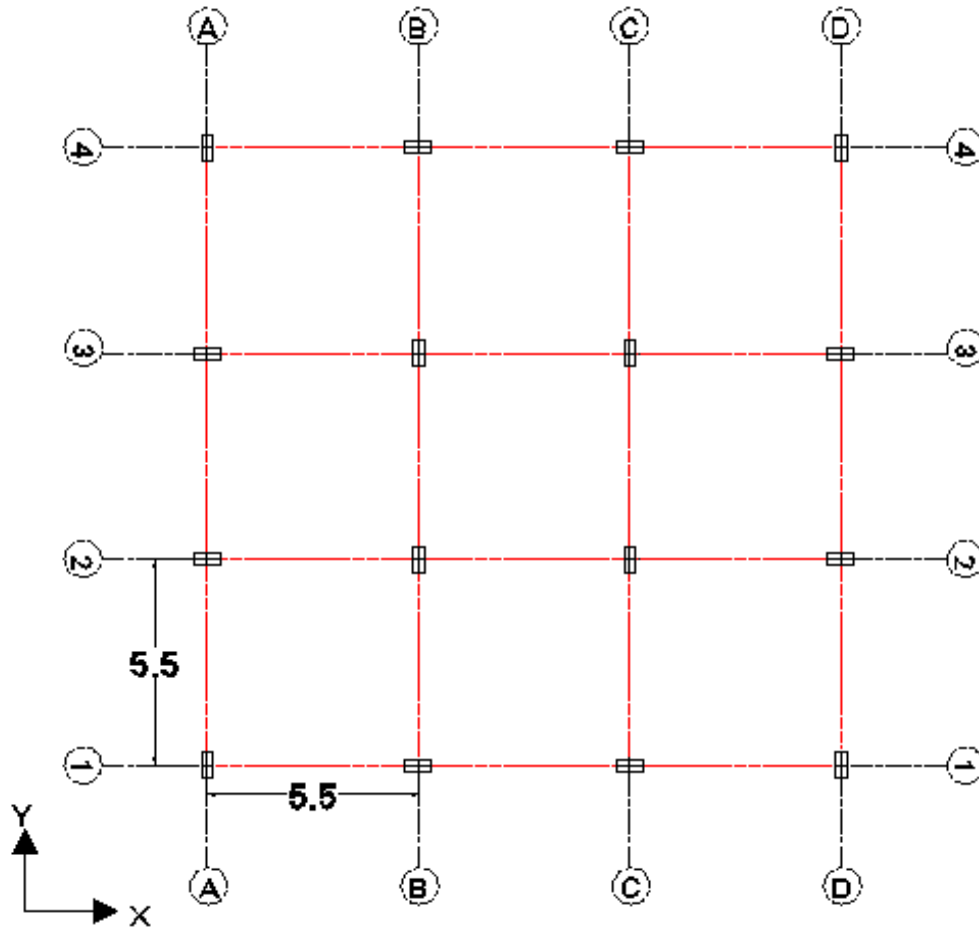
Plan view of the existing RC building for all cases (2, 4, 6, and 8 storey)
